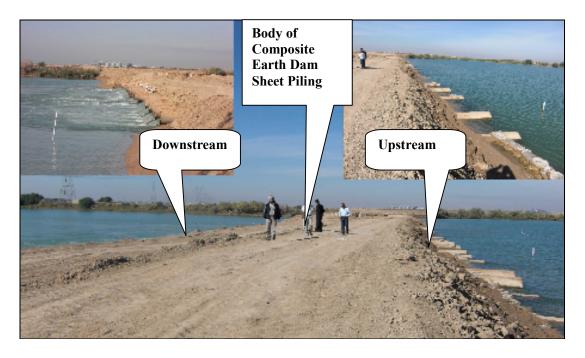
Earth Dam Sheet Piling Makes the Different Water Level more than +1.00m
